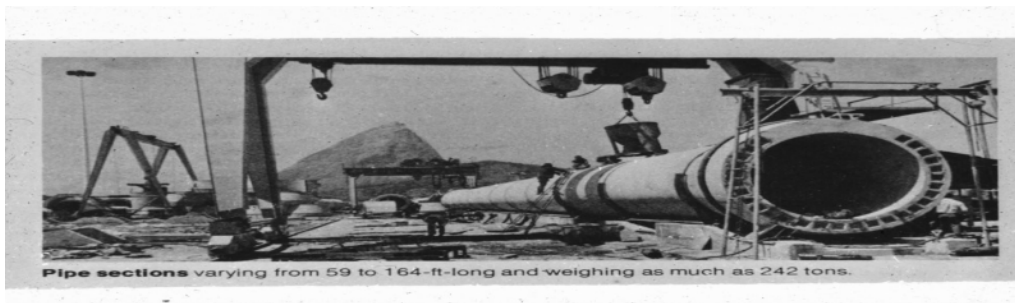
Image from the construction site of the Ipanema outfall (reproduced from Grace, 1978)
